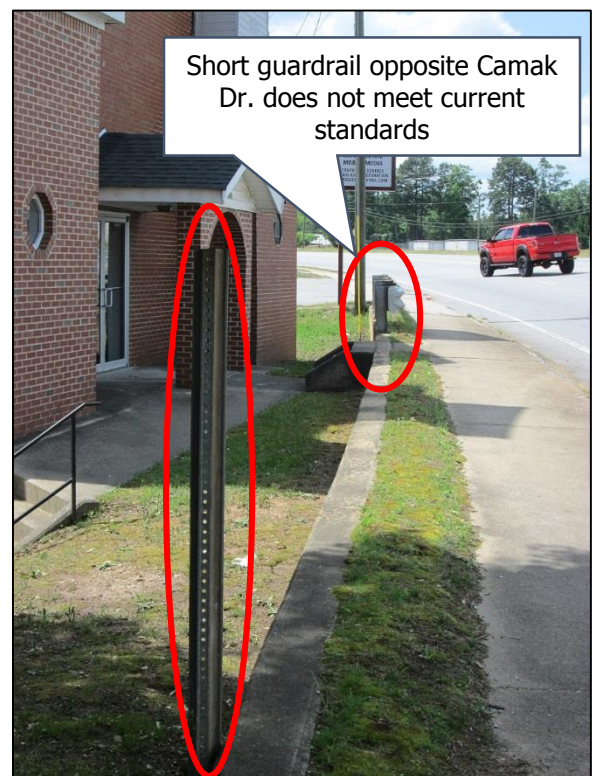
EMPTY SIGN POST, SHORT GUARDRAIL, AND SIDEWALK WITH NO BUFFER NEXT TO TRAVEL LANES IN FRONT OF ST. JAMES BAPTIST CHURCH OPPOSITE OF CAMAK DRIVE.
